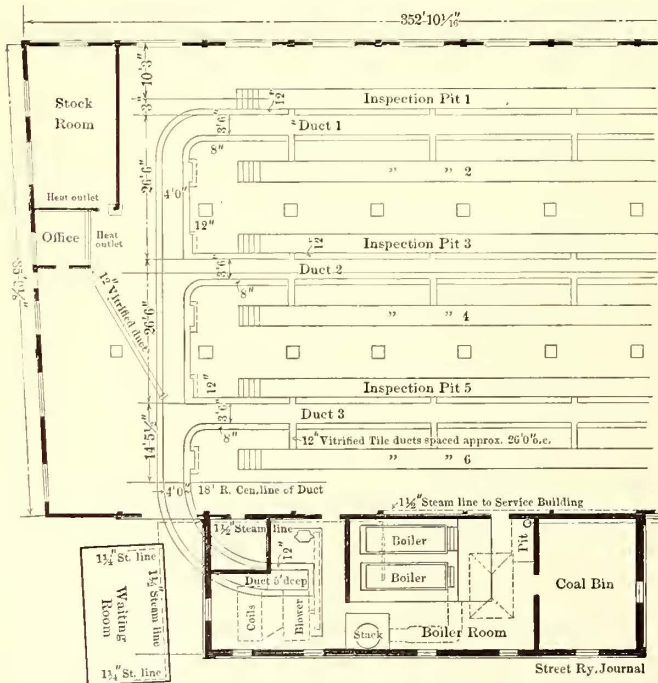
LAYOUT OF HEATING CONDUITS AND STEAM LINES
